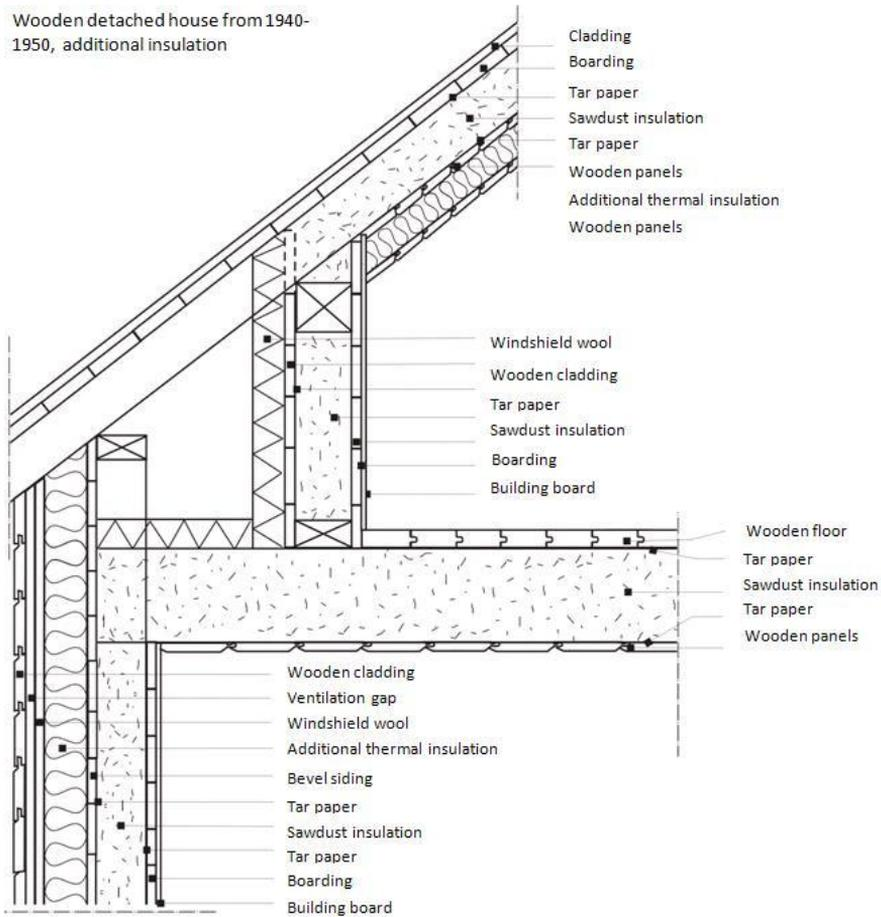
Roof and intermediate floors of detached wood houses of 1940's–1950's, with additional thermal insulation.
